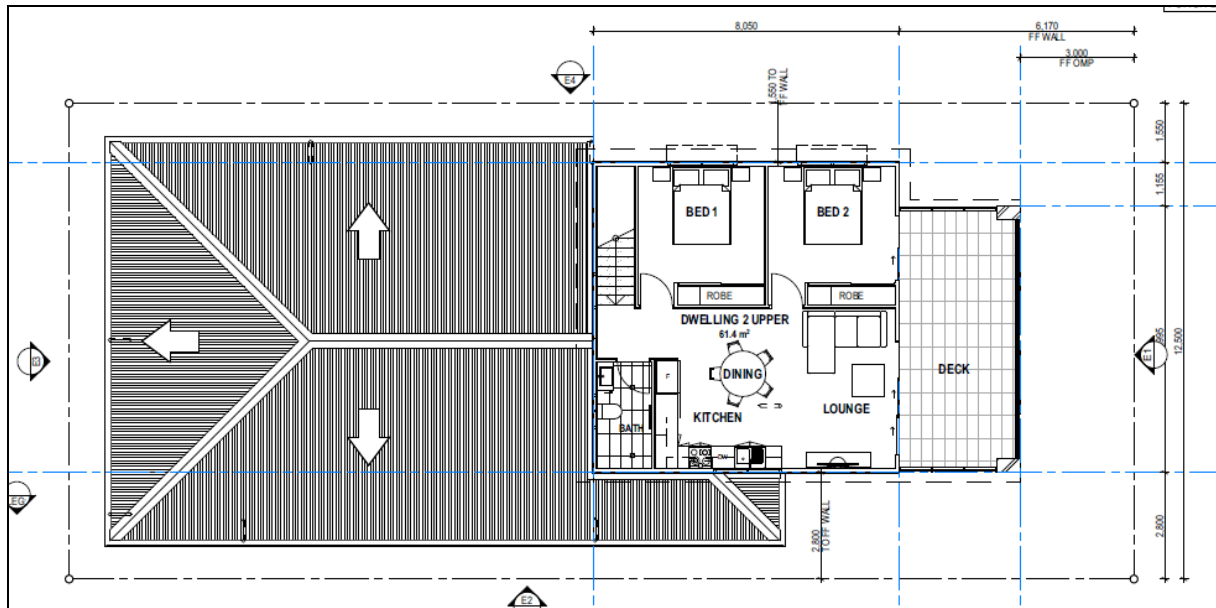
Type 2 Level 1 floor plan (Source: Ultra Linea Architecture)
